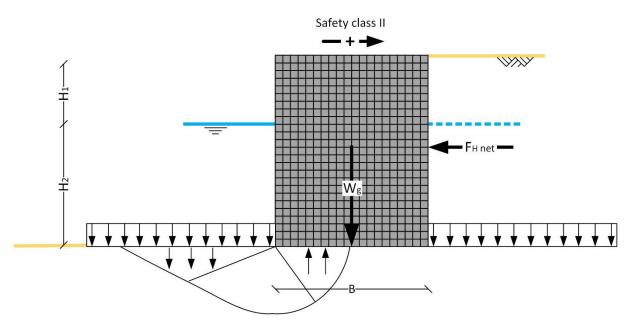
All relevant pressures, forces and dimensions for the failure mechanism 'Bearing failure'
